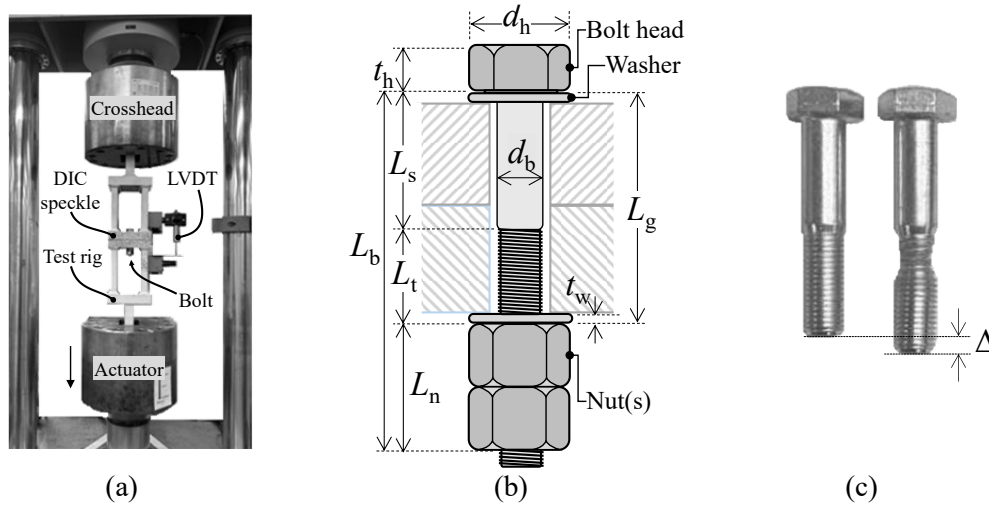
Tensile bolt testing: (a) test machine and setup, (b) test rig cross-section and bolt assembly, and (c) true bolt axial elongation.
